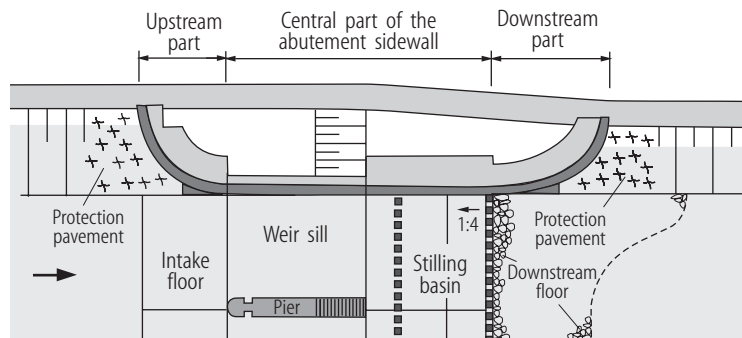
Principal construction elements of a weir and the abutment sidewall in plan view.
